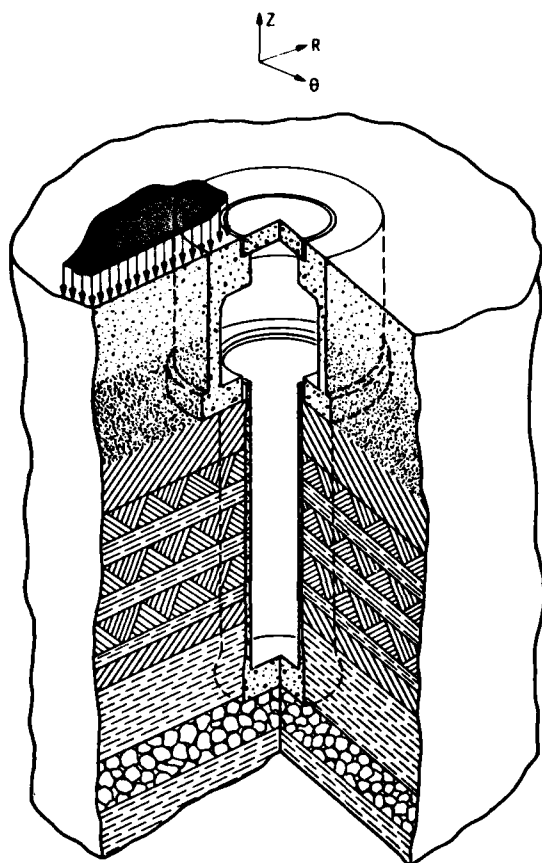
Site of underground reinforced-concrete structure subjected to overhead blast loading
